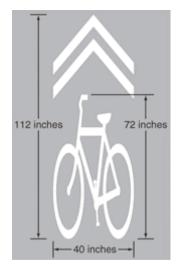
Shared Lane Marking road pavement symbol (Source: MUTCD)
